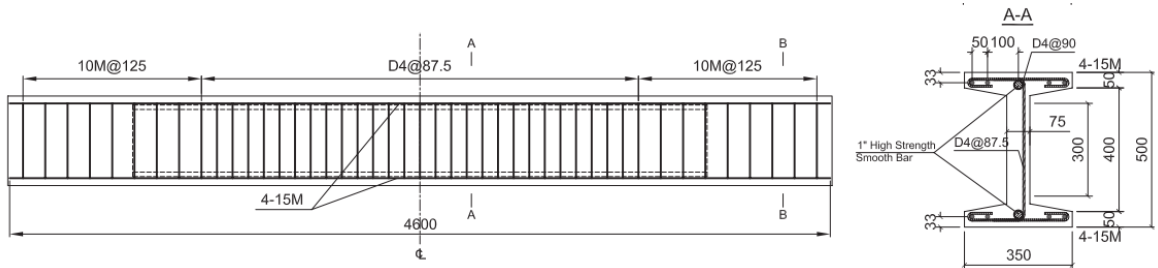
Shear reinforcement in the beam LB10 [13]
